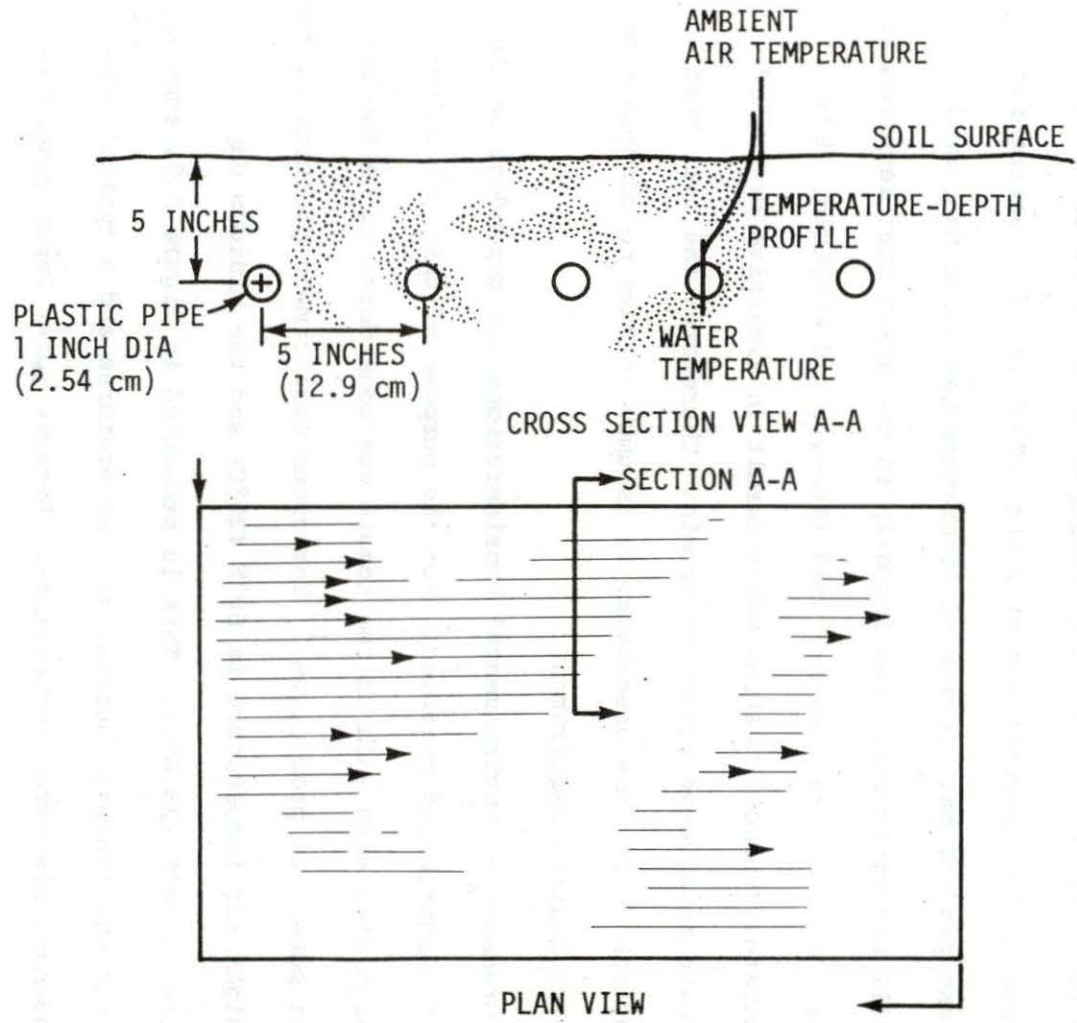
Assumed piping layout for greenhouse and field soil heating
